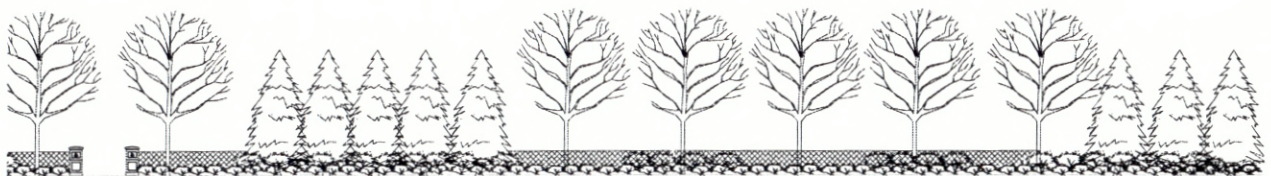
ELEVATION OF WINDOW STREET BUFFER
